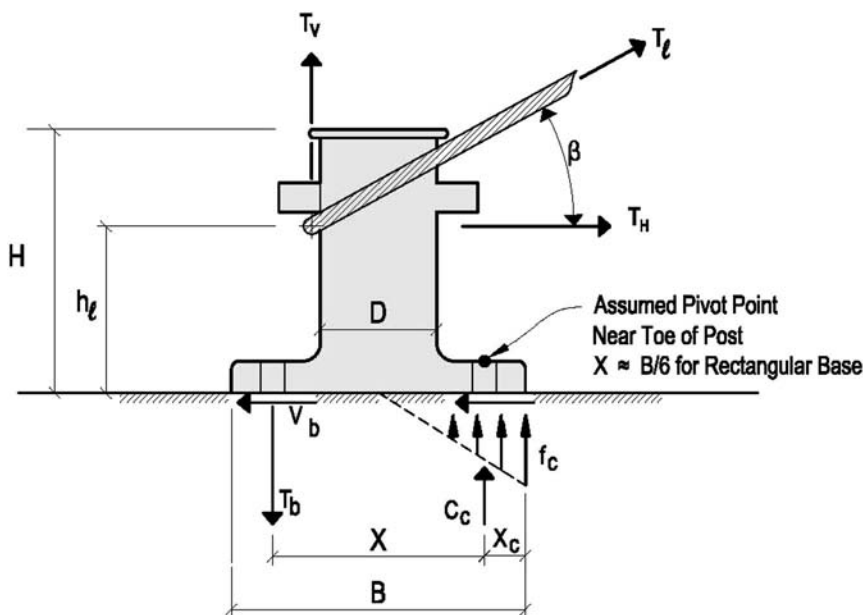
Bollard anchorage schematic showing forces and reactions
